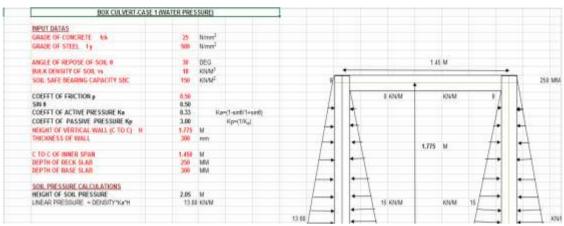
DESIGN PROBLEM FOR CULVERT FOR CASE 1
